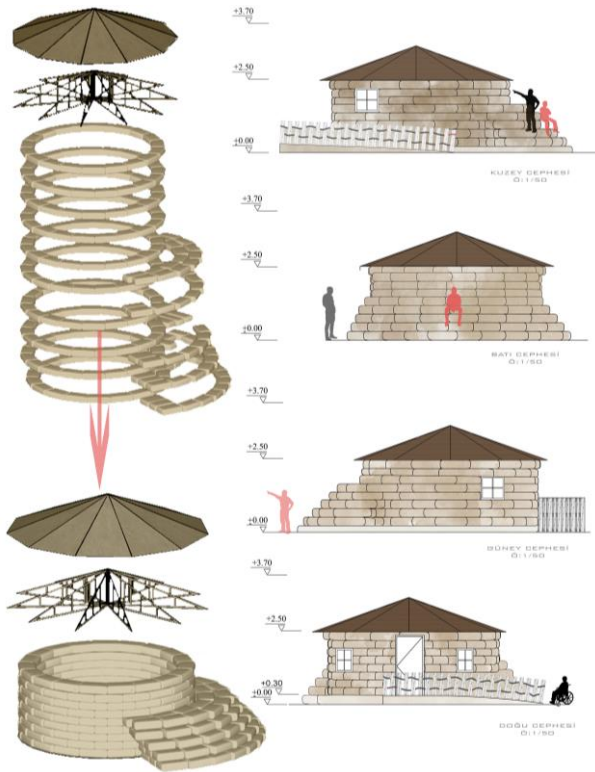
Alternative 1: View and perspective of the wooden roofed changing room and tribune
